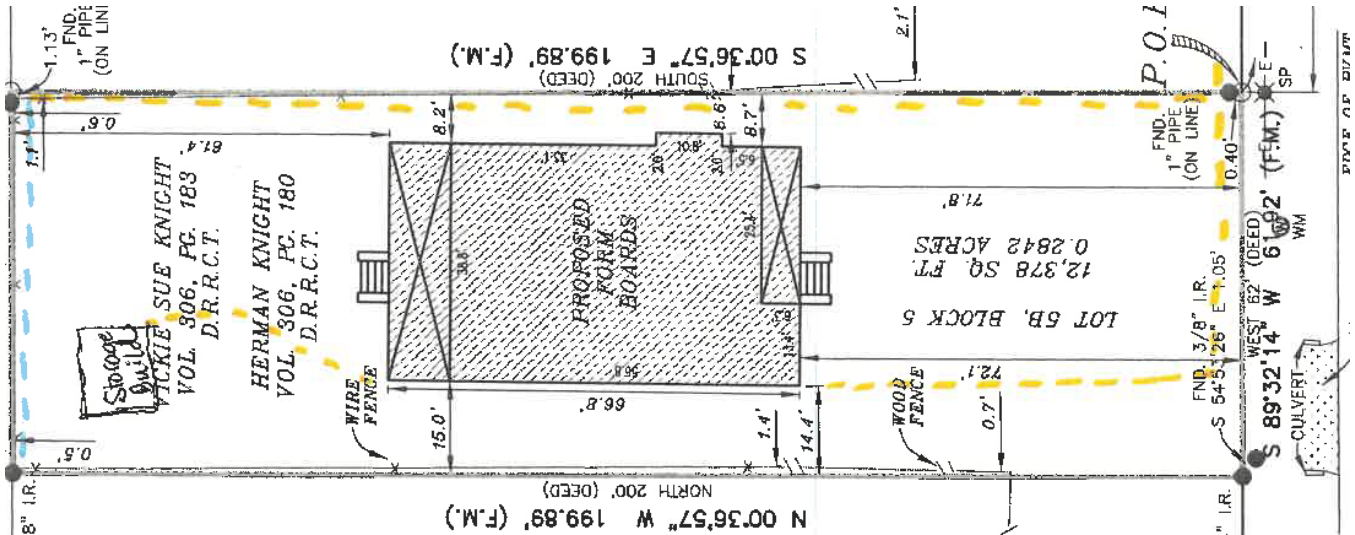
SITE PLAN OF FENCE LOCATIONS. (BLUE: WOOD; YELLOW: VINYL PICKETS)
